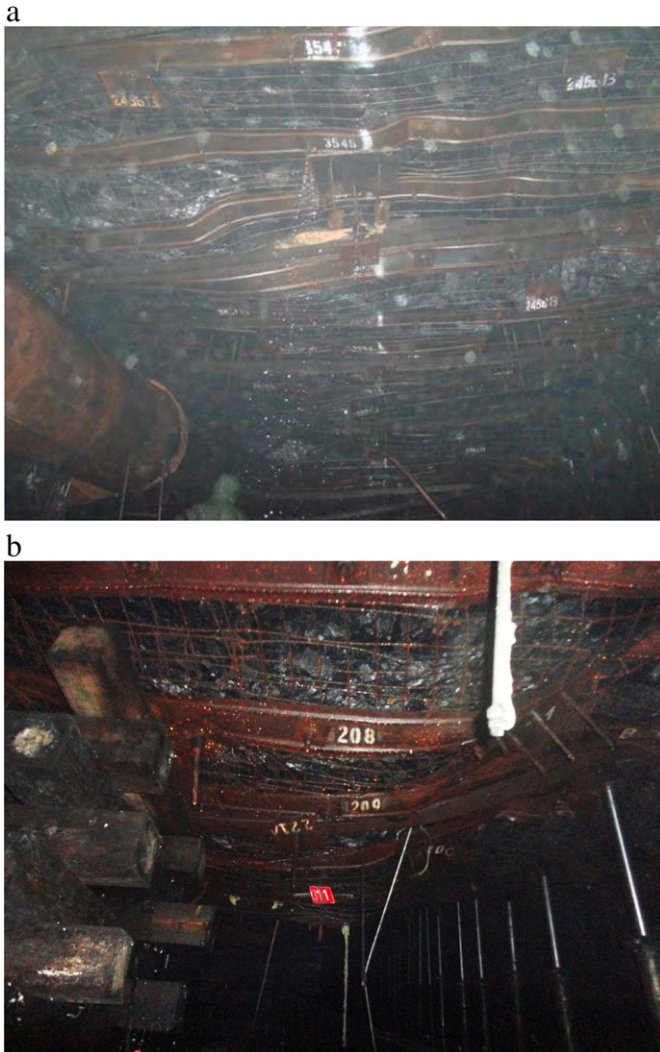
Roof conditions of the roadway at Majialiang coal mine, (a) groundwater infiltration during roadway tunneling, (b) roof deformation and failure.
